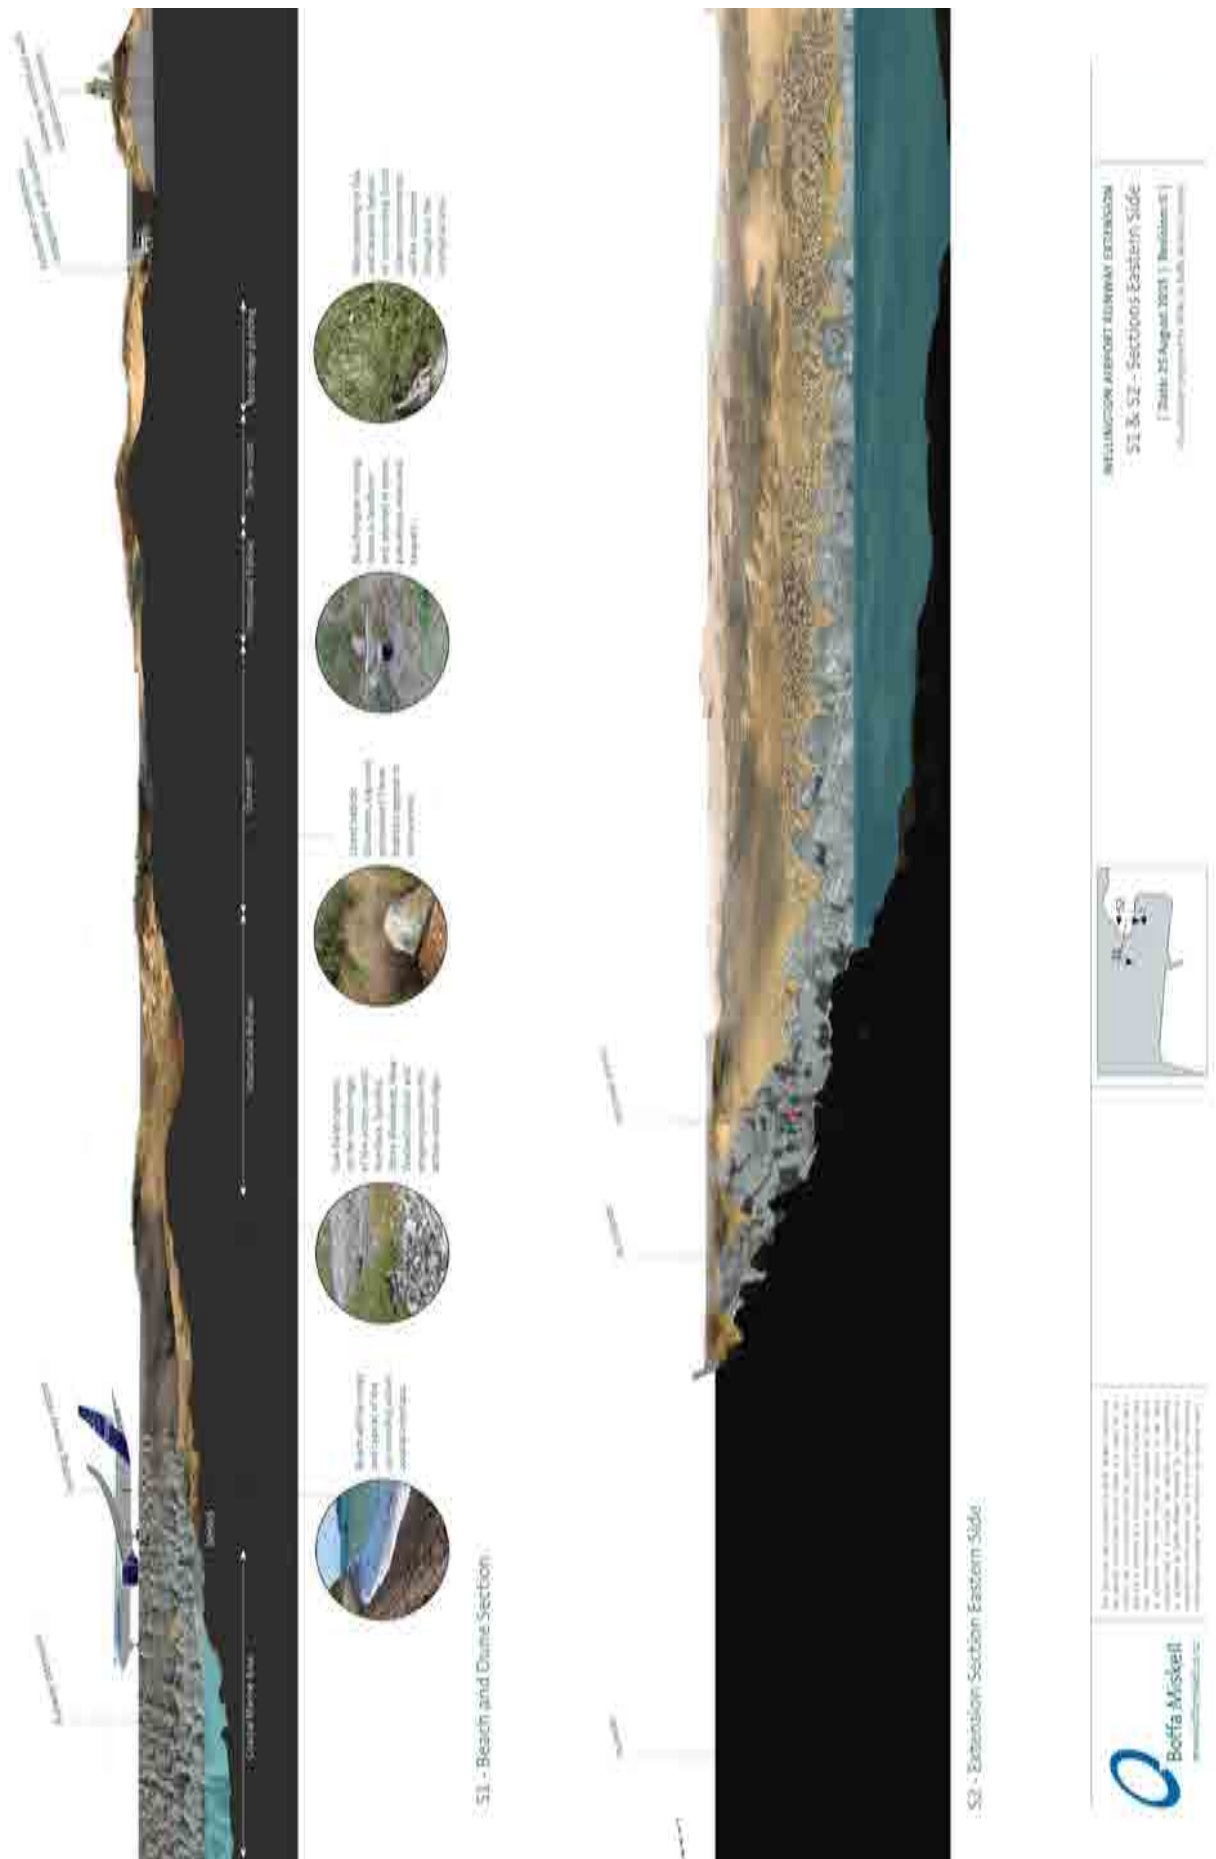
Indicative cross sections of Moa Point Beach runway extension edge.
